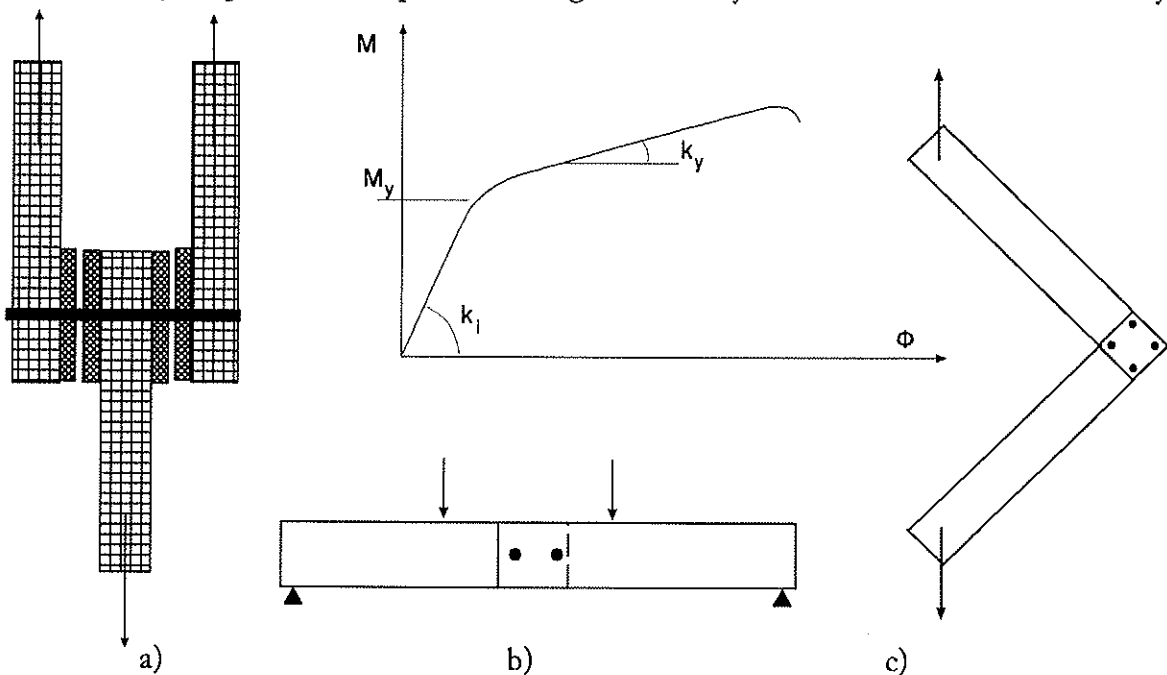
Test specimens of Werner a) , Rodd b) and Leijten c)
